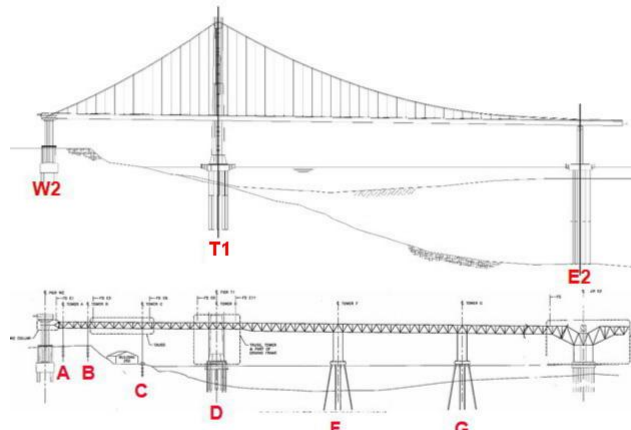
Location of Permanent Tower and Piers and Temporary Towers
